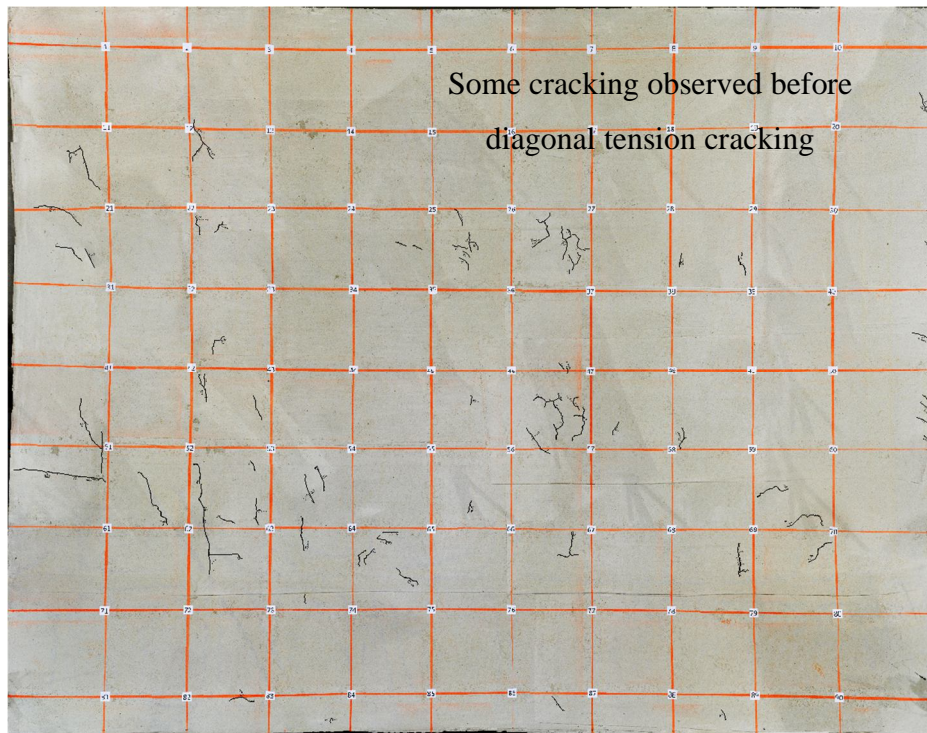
Crack Distribution of Specimen 3/7.5-4-N-NF-DT Before Diagonal Tension Cracking (Point B in Figure 3-13)
